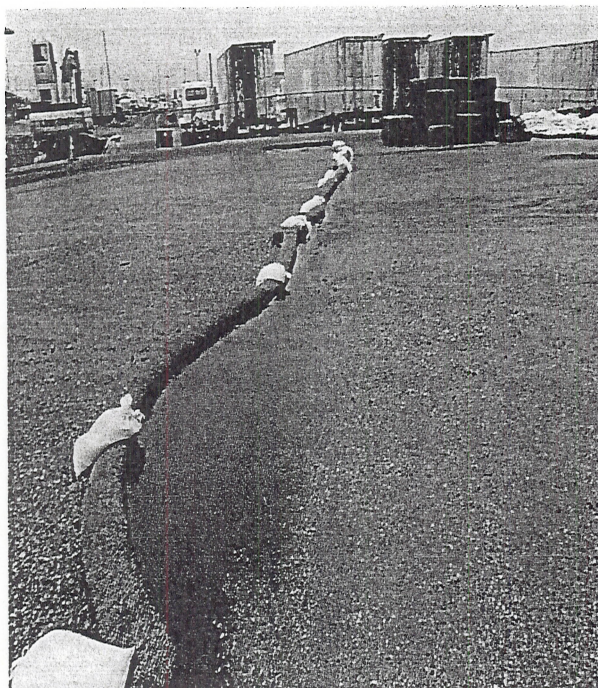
BMPs placed in December 2014. Note slight ponding of leachate. Ponding on the cover is a violation of the CAO and WDR.
